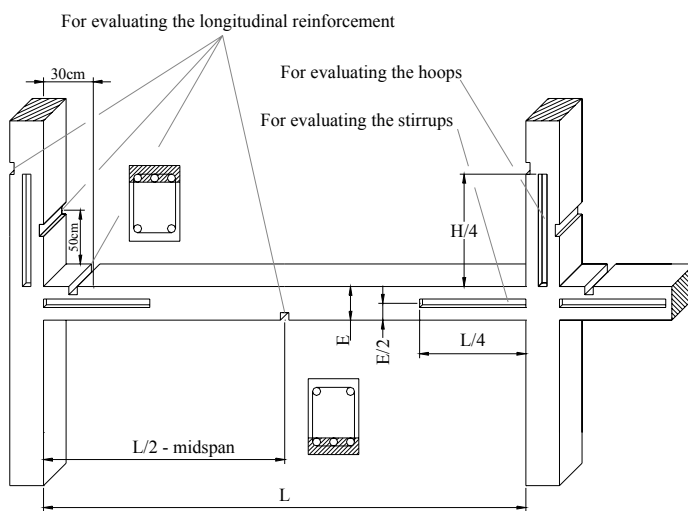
Slits applied on beam and column elements for assessing the reinforcement arrangement.
